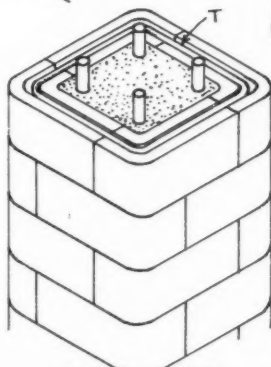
TIMBER SHUTTERING IS SAVED BUT STRUTTING IS NECESSARY TO SUPPORT SLABS FOR FLOOR & BEAM.
